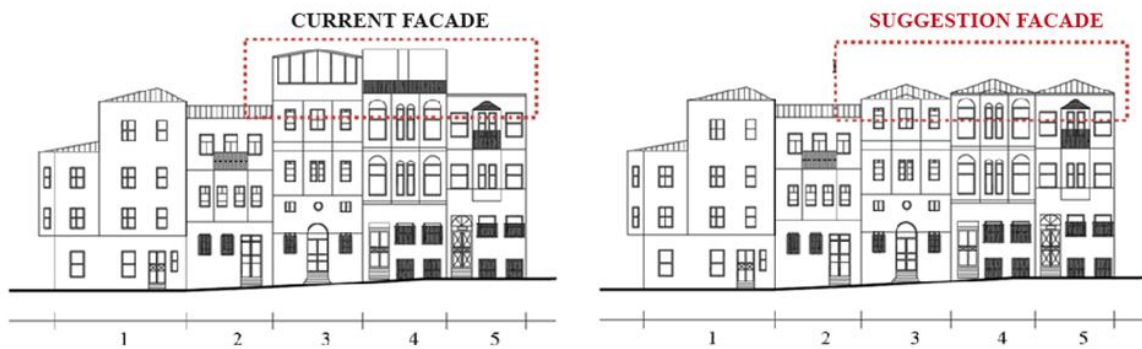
Bereketli Street Building Elevation and Eave Elevation Suggestion
